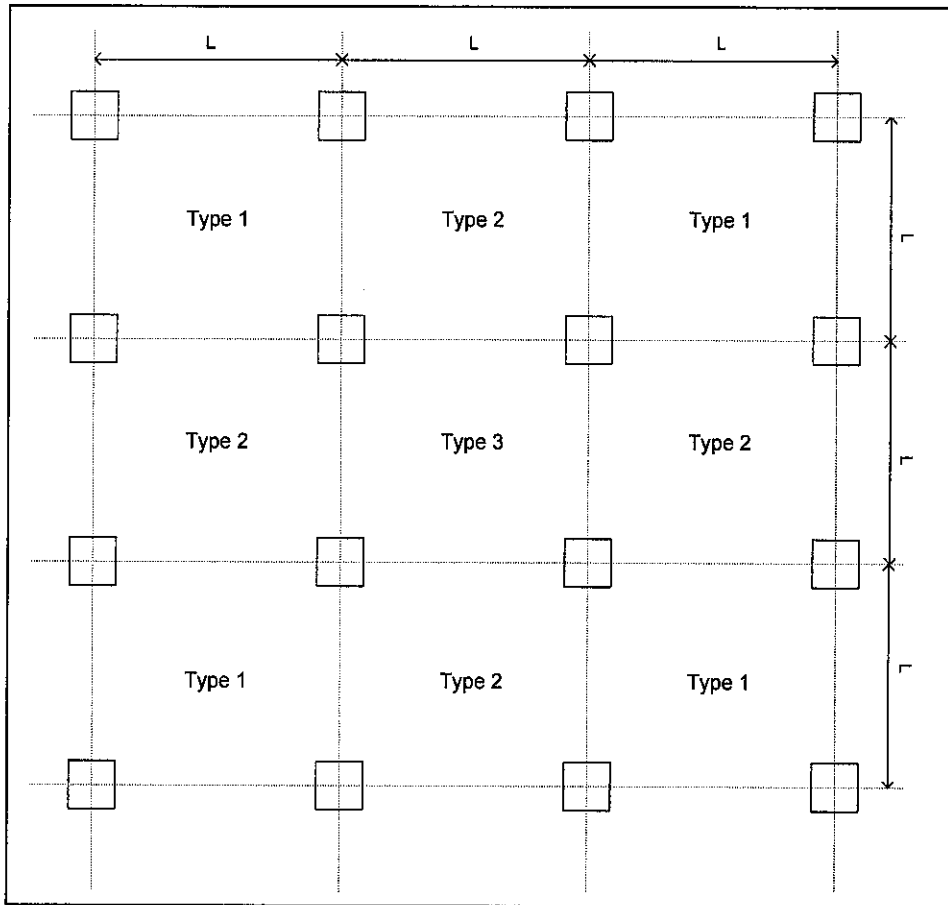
Typical Arrangement of Columns in Two-way Spanning Slabs.
